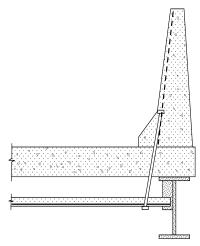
Barrier wall connected directly to girders and cross-frames.
